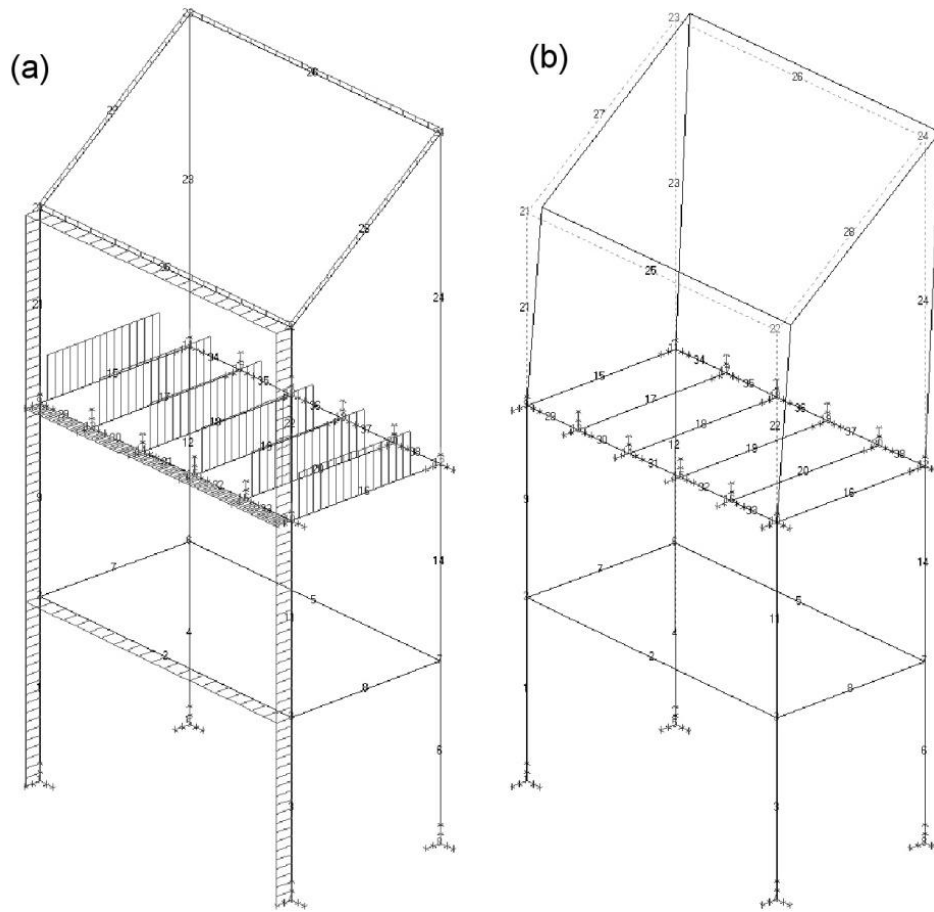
Estructural design: a) Location of the distributed loads ; b) Deformed structure
